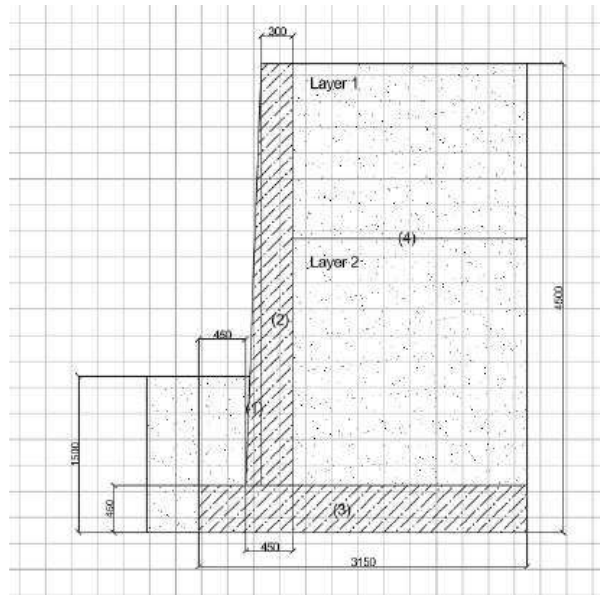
AutoCAD drawing of cantilever wall with dimensions
